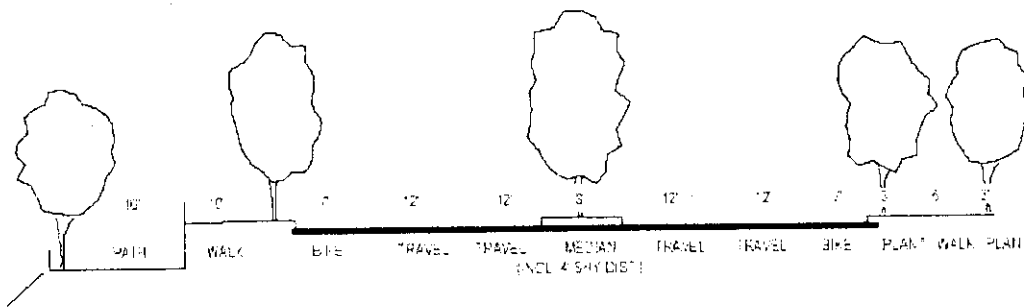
Cross-Section 100 Feet North of Clackamette Drive Overpass, Looking North
